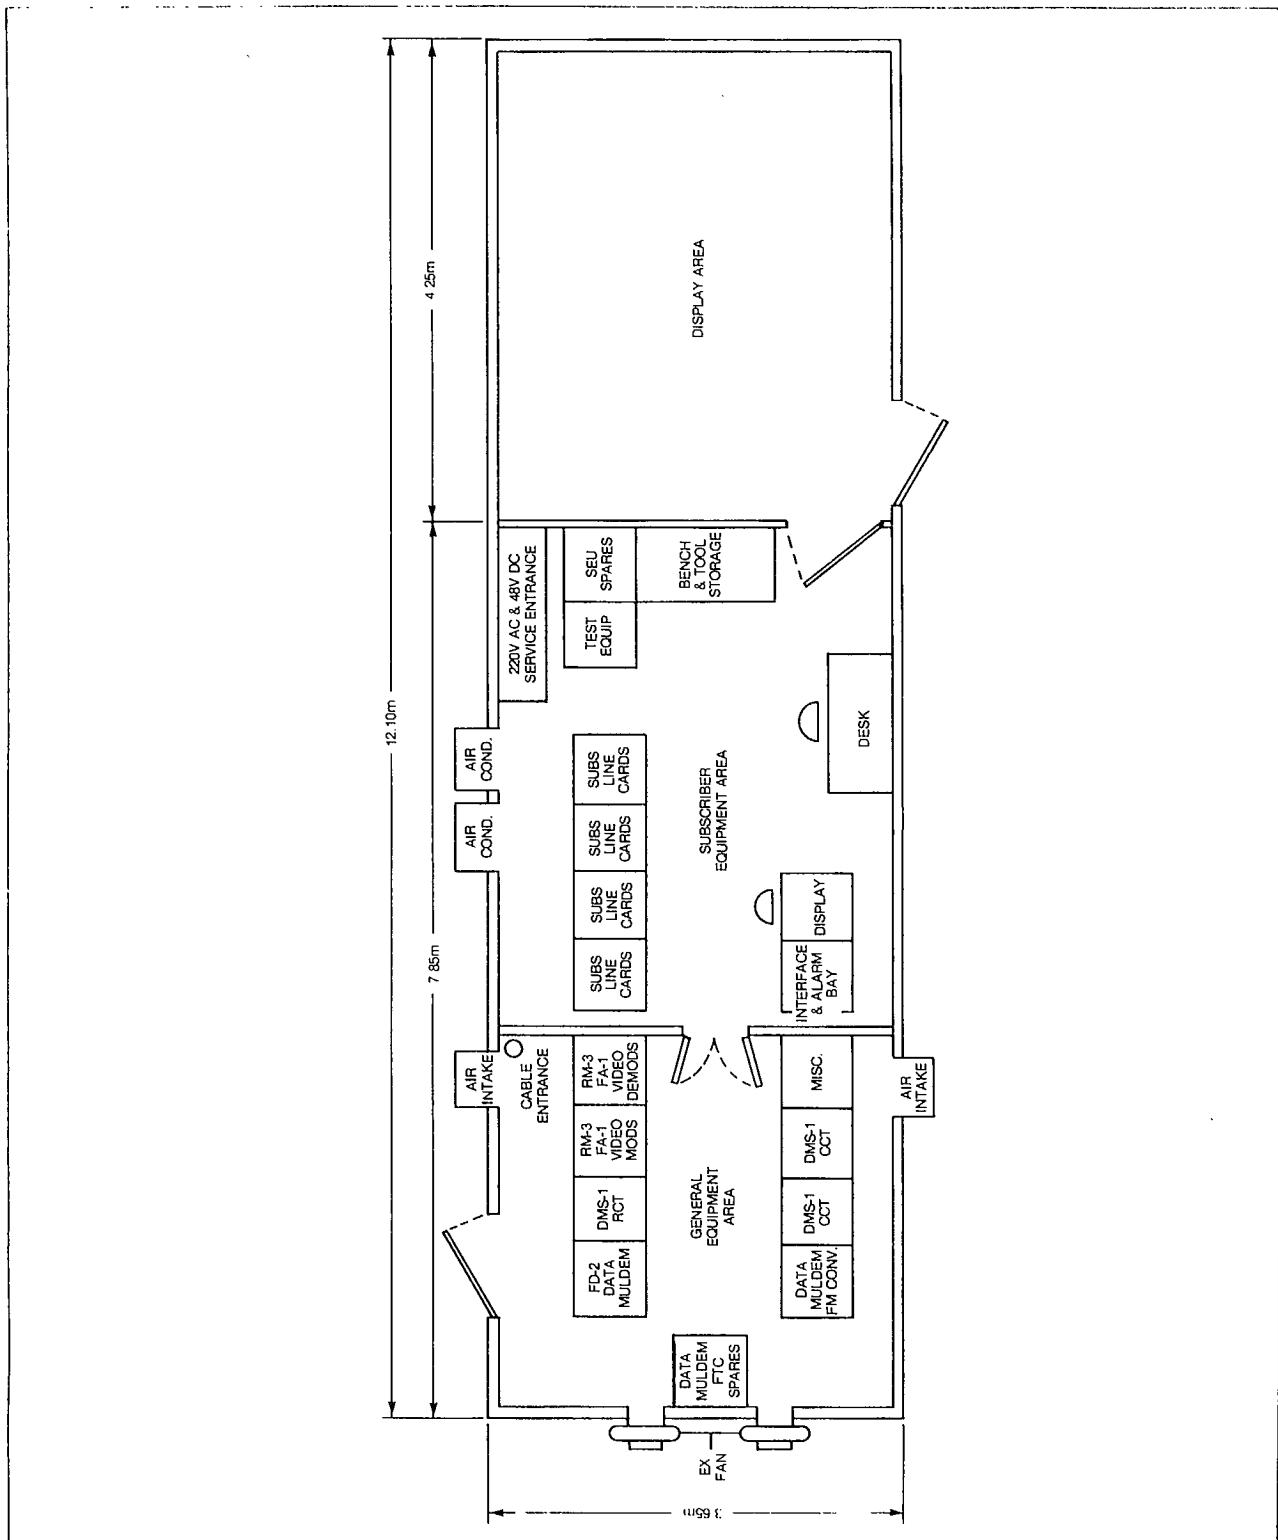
Floor plan and equipment arrangements in the FTC trailer
